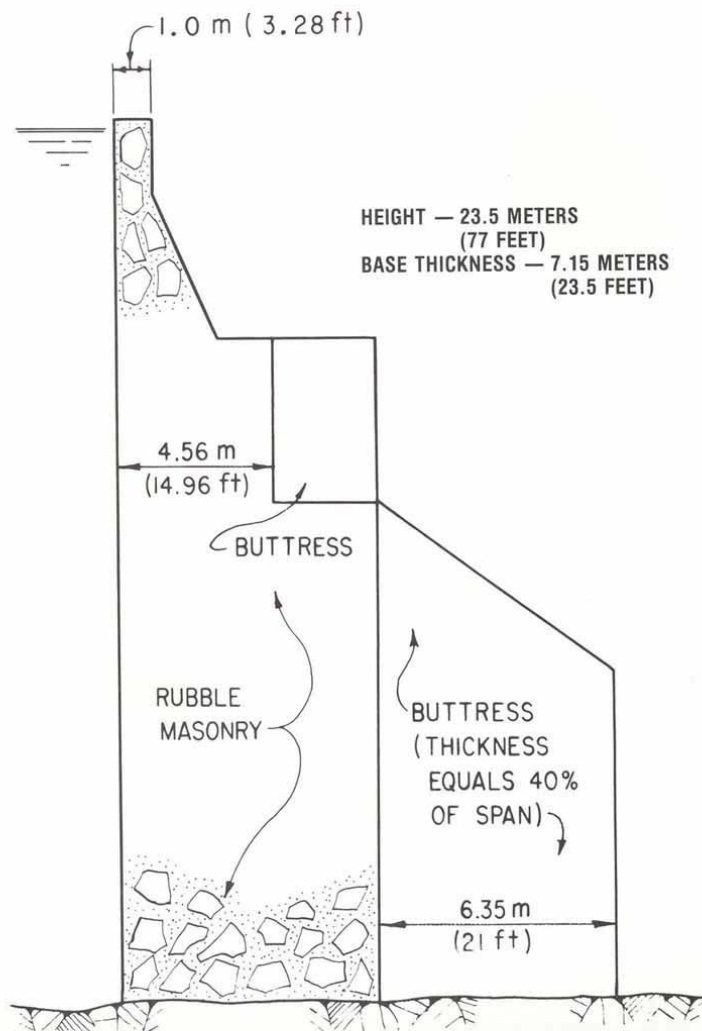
Pabellón (San Blás) Dam, cross section. P-801-D-79299.
